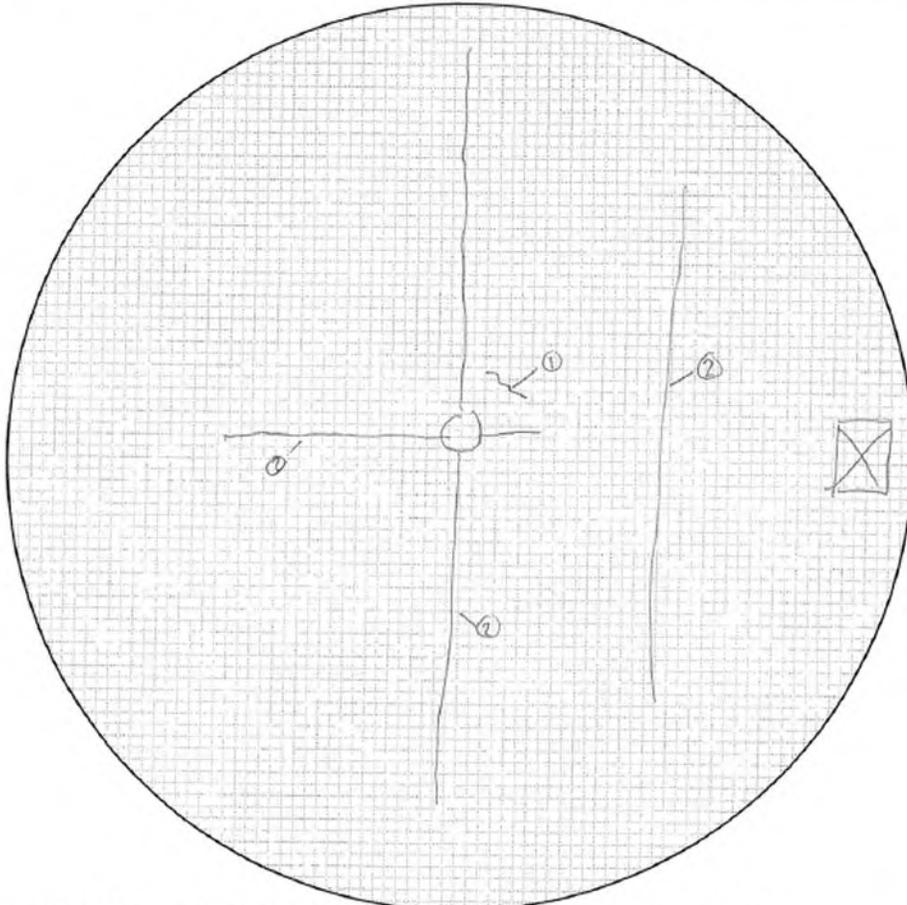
Reservoir INTERIOR REFLECTED ROOF Plan – Note location of columns, hatches, ladders, and manways (if present). List given and measured diameter. (Note columns on next sheet)
